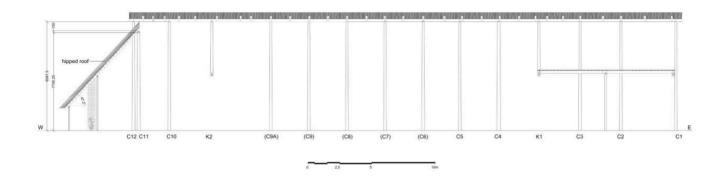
IDEALISED RECONSTRUCTION OF A CROSS-SECTION ALONG THE BUILDING, SOUTH OF ITS LONGITUDINAL AXIS. THE POST PITS HAVE BEEN OMITTED.
